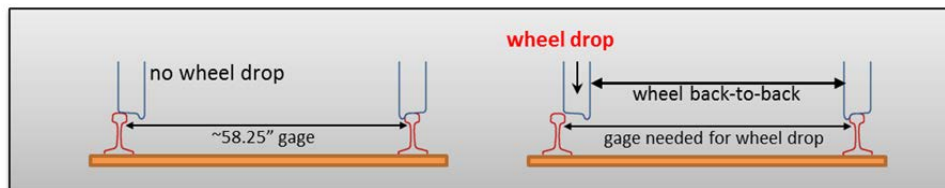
Amount of gage needed for wide-gage wheel-drop derailment is a function of wheel thickness, wheel back-to-back spacing, and flange thickness.
